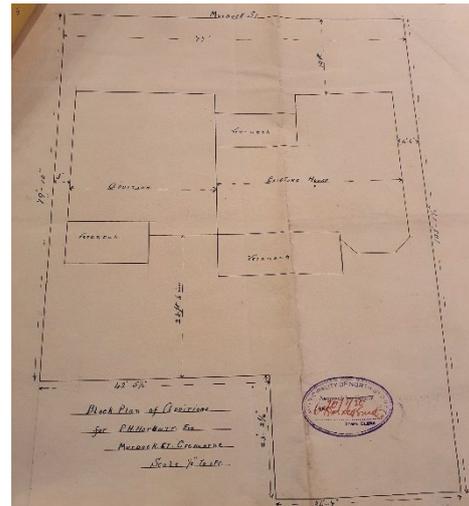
Block plan accompanying application to extend the building on Lots 6 and 7 Murdoch Street in 1920.
